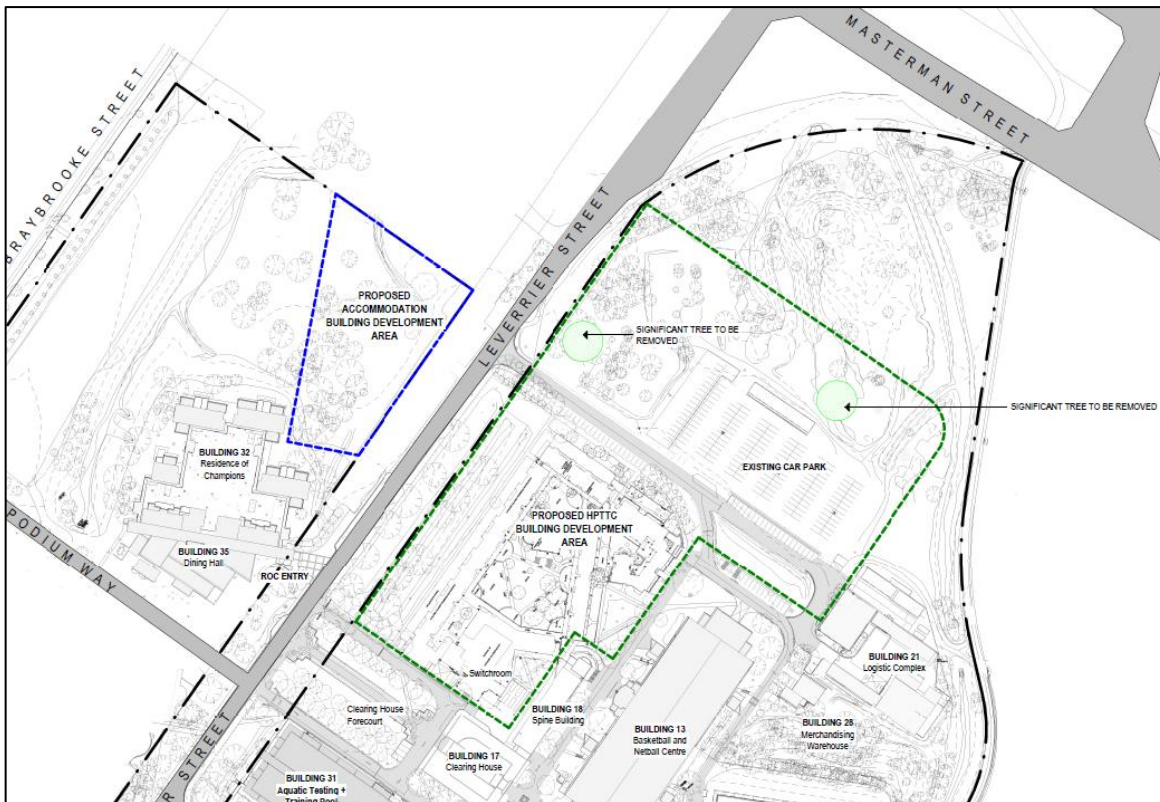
Existing site plan (source: Populous Survey Plan AT-16-0001(B) dated 3/11/25)
